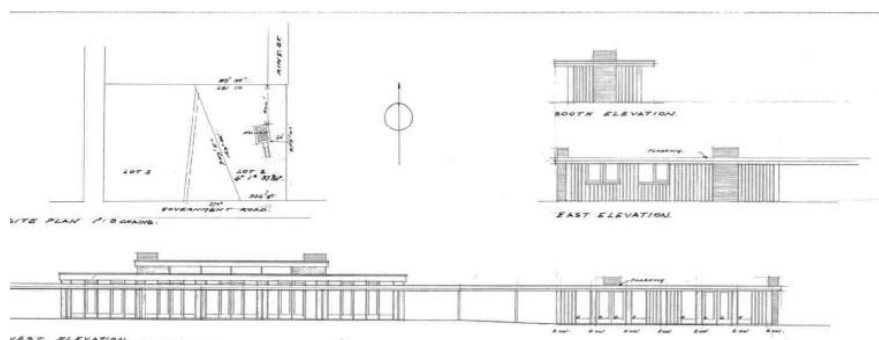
Site and elevation drawings of Knox's own house (constructed c 1962-63) at 2 King Street, Eltham. Source: Alistair Knox Foundation.
